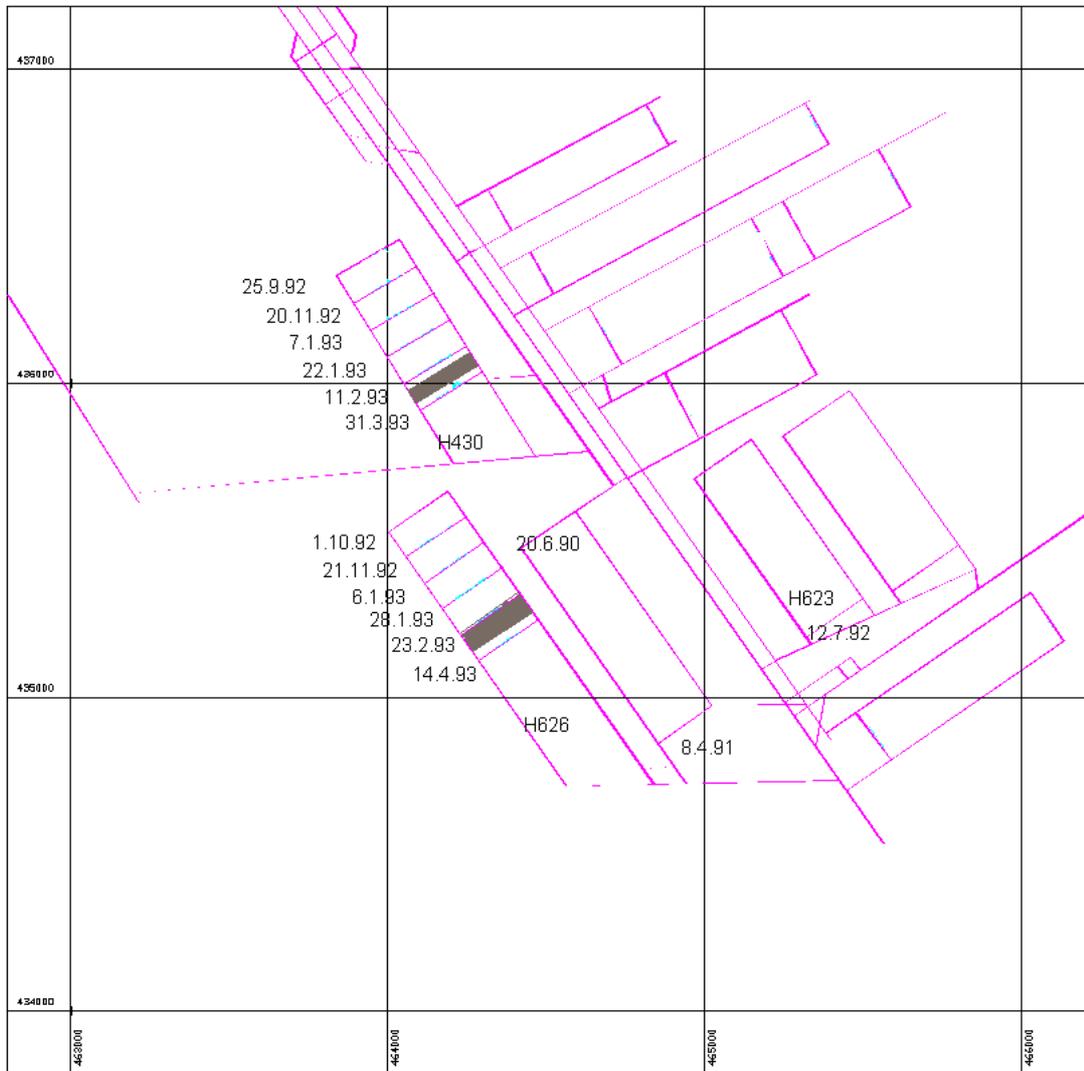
Mine workings drawing showing panel numbers and progress dates of coal faces.
